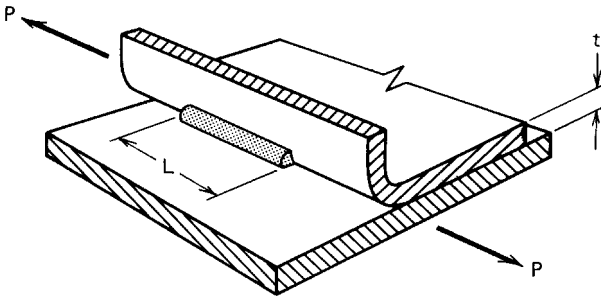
Longitudinal flare bevel weld.^{1,314}
